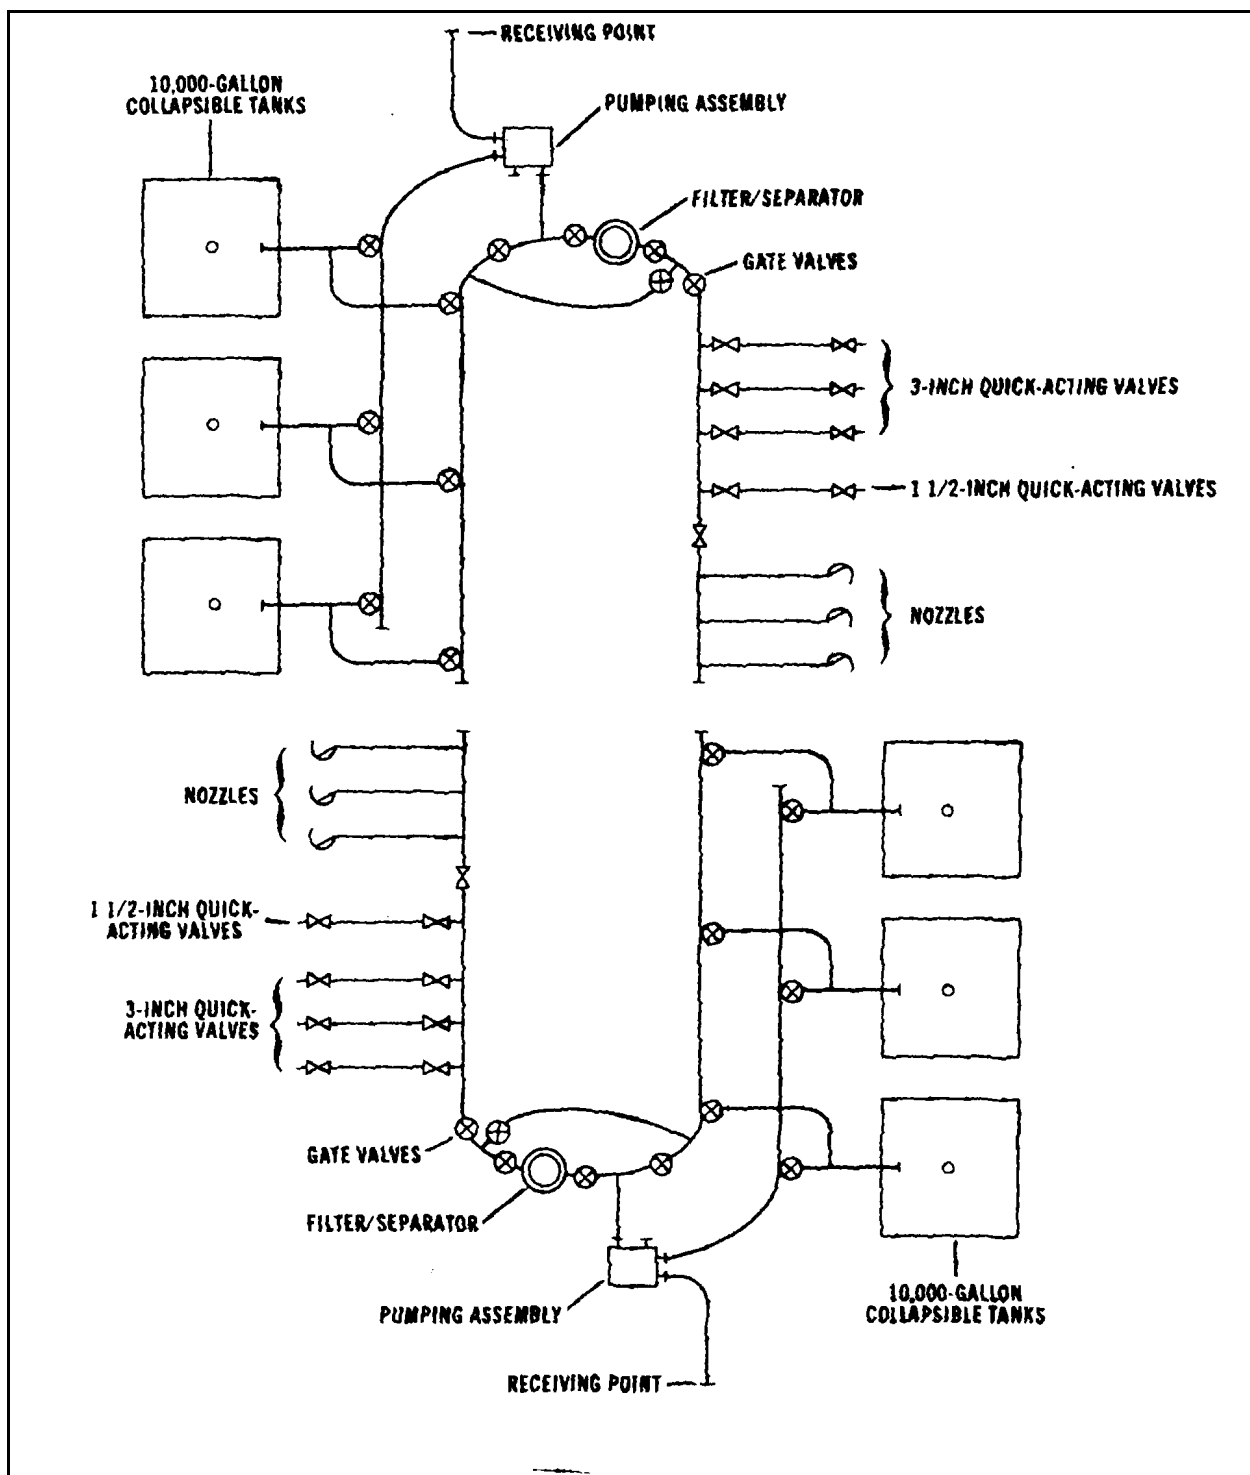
Suggested layout for fuel system divided for handling two different fuels or for moving
